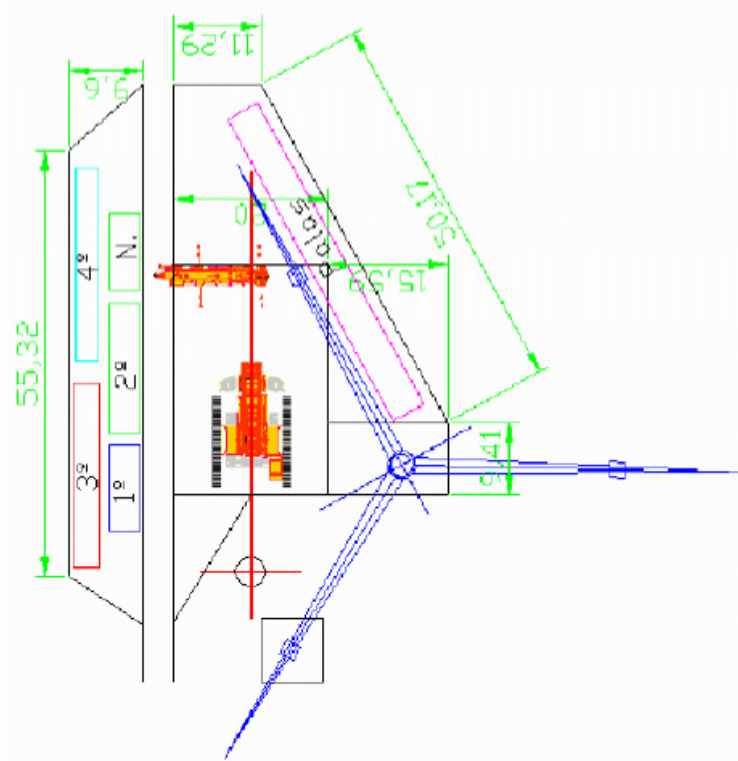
Example Schematic of Turbine Assembly Area Plan.
